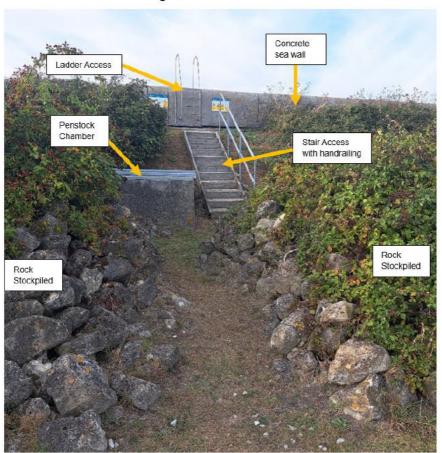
Penstock chamber and adjacent site features (photo taken from dry side of the sea wall).
